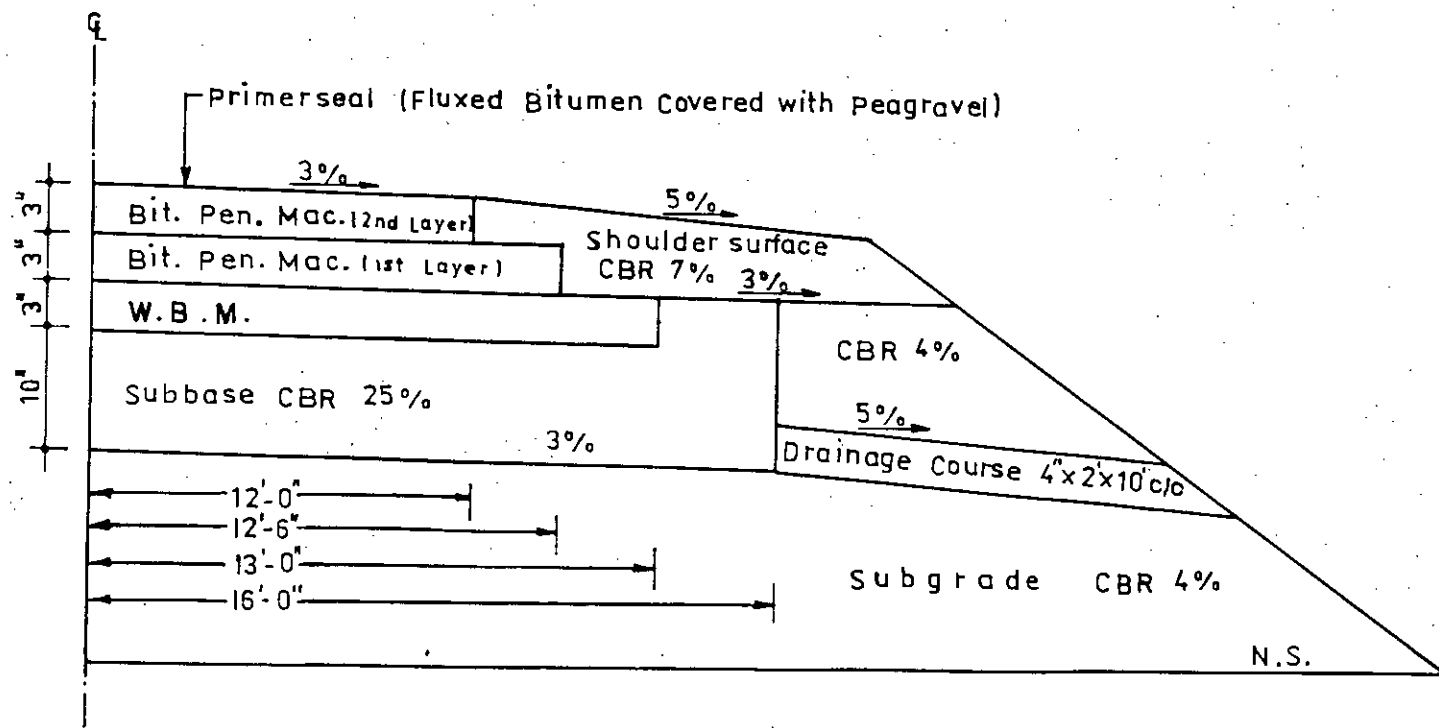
PAVEMENT SECTION FOR 1ST 9.7 MILES
